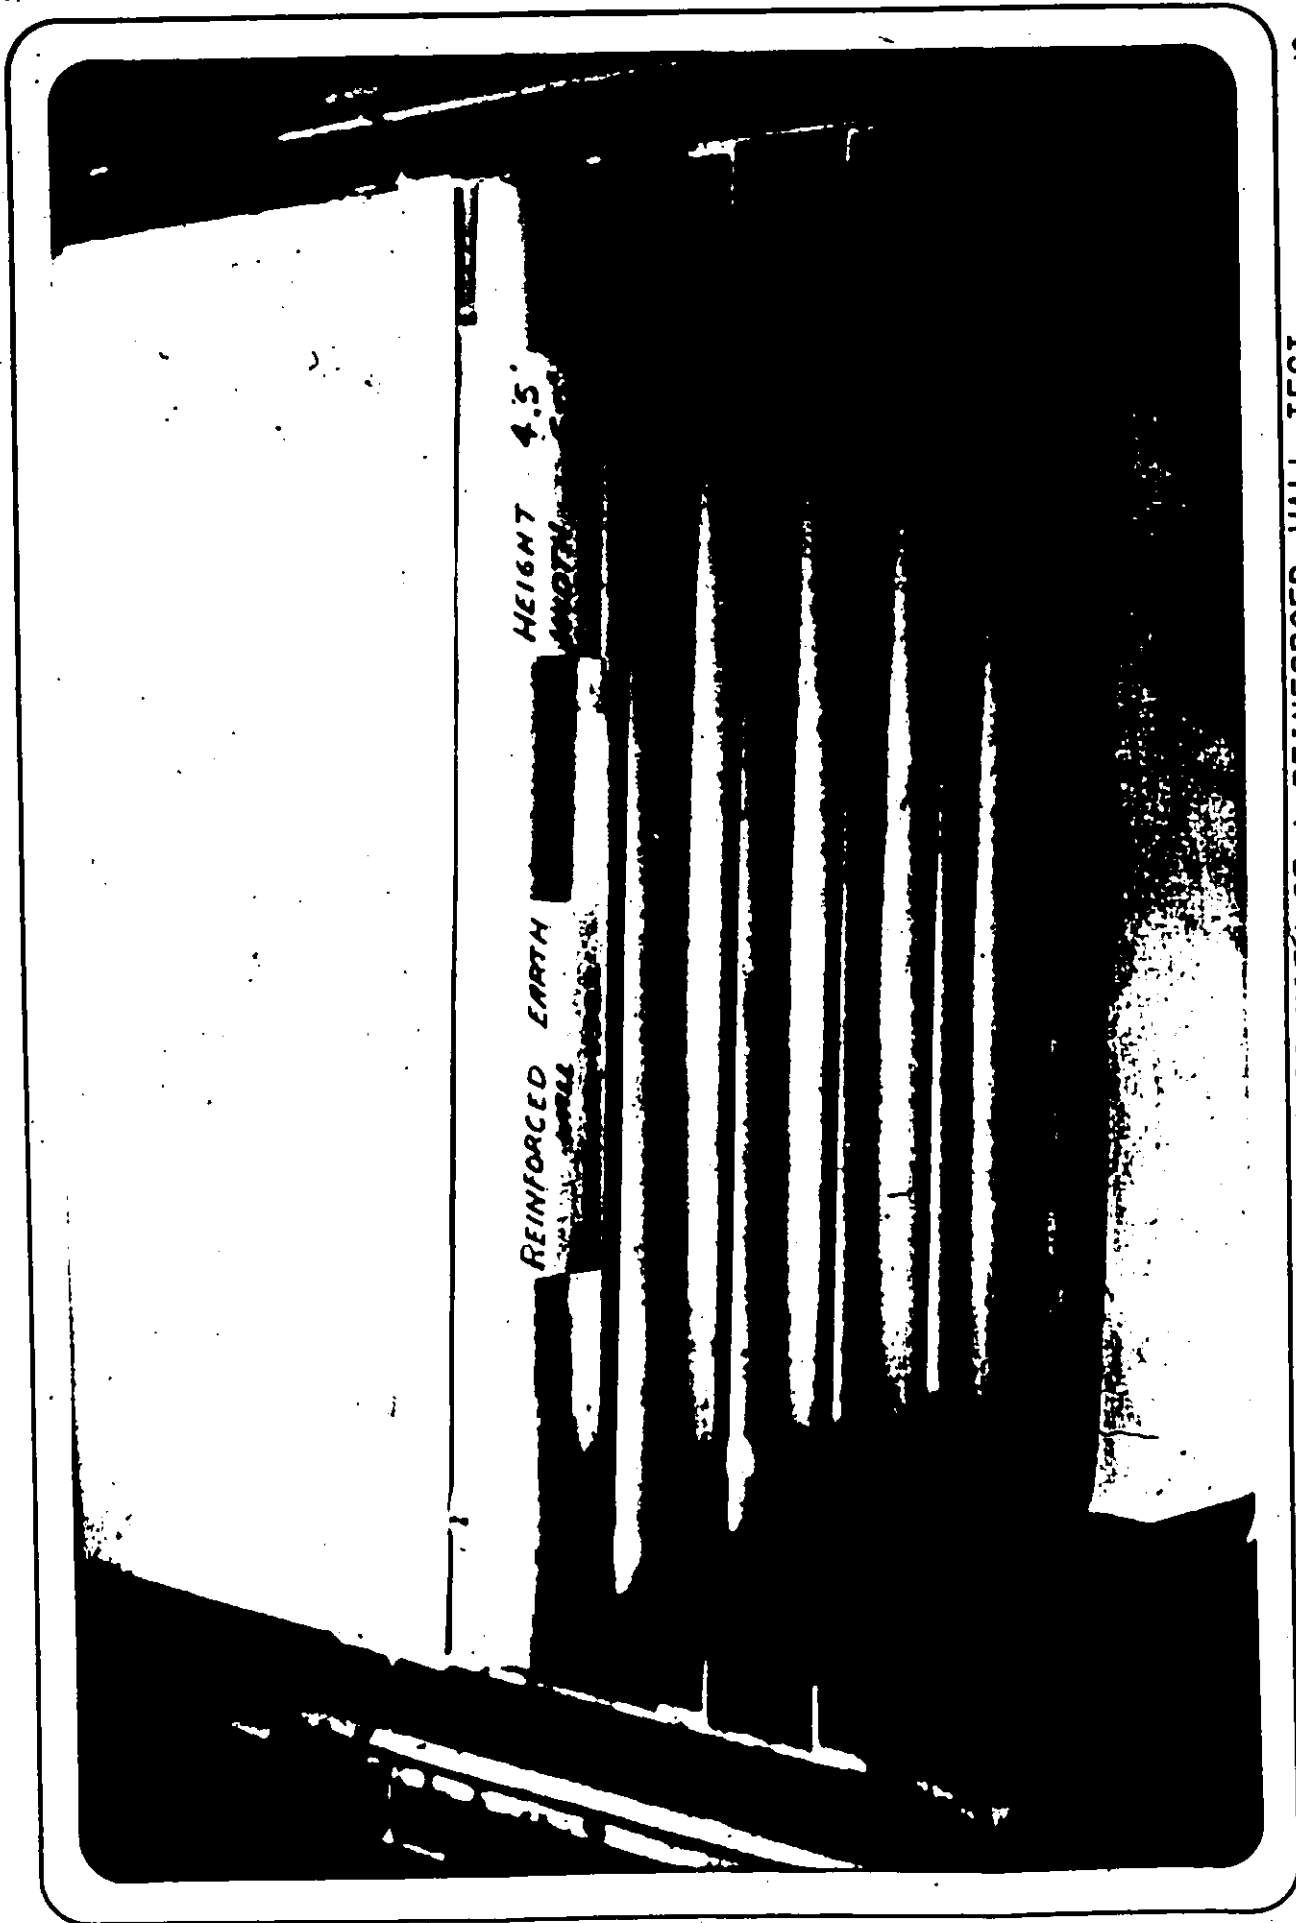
PHOTOGRAPHIC VIEW OF A REINFORCED WALL TEST
